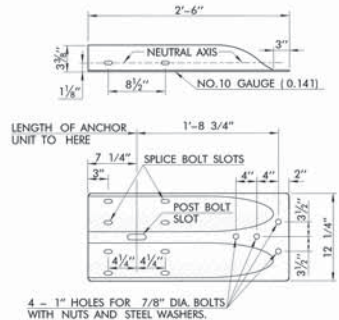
DETAIL 'A' ANCHOR DEVICE (5/8" BOLT)
